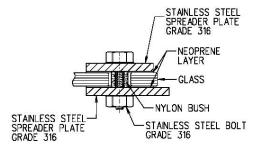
TYPICAL POINT SUPPORT DETAILS
